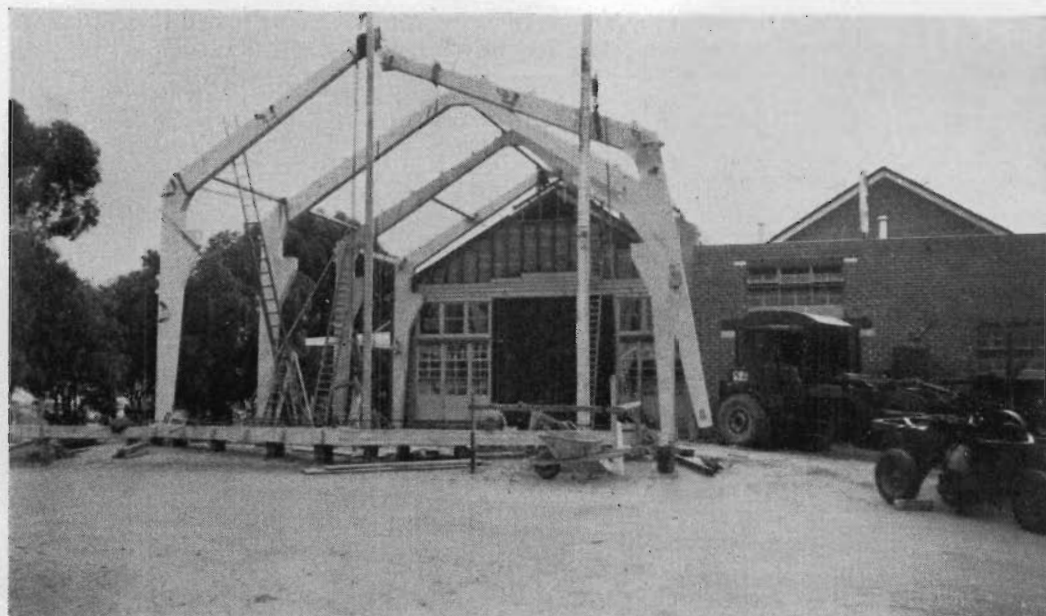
Precast concrete frames being erected for the Bendigo workshop extension.
